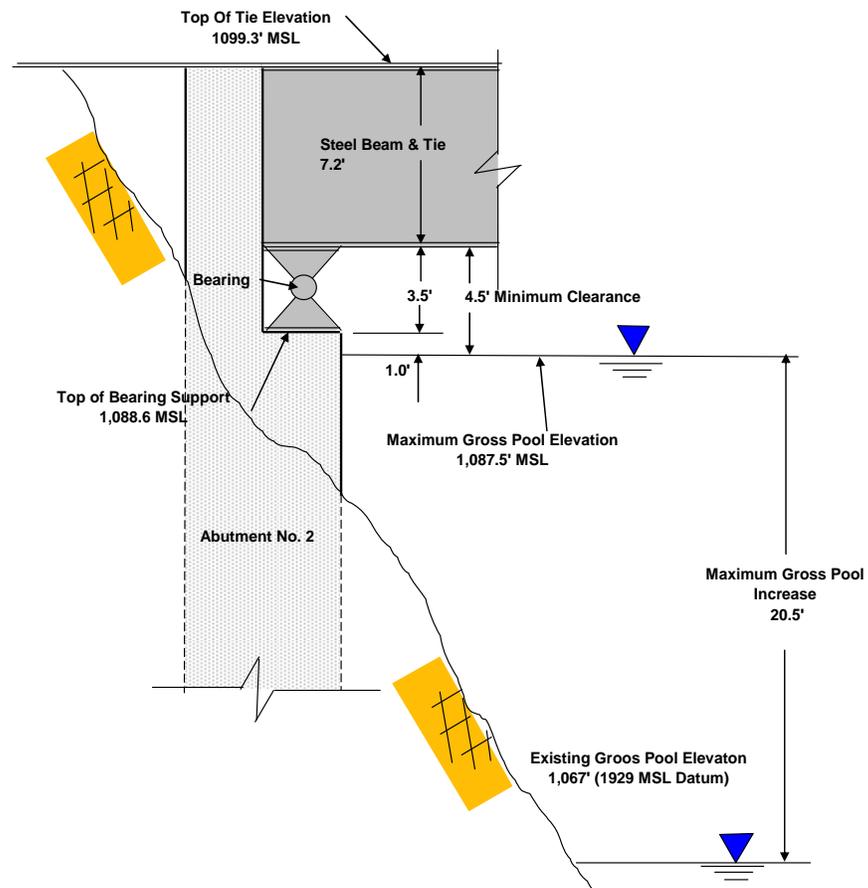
Elevation Sketch Showing the South End of the Pit River Bridge with Respect to the Existing and Increased Full Pool Elevation at Shasta Lake
